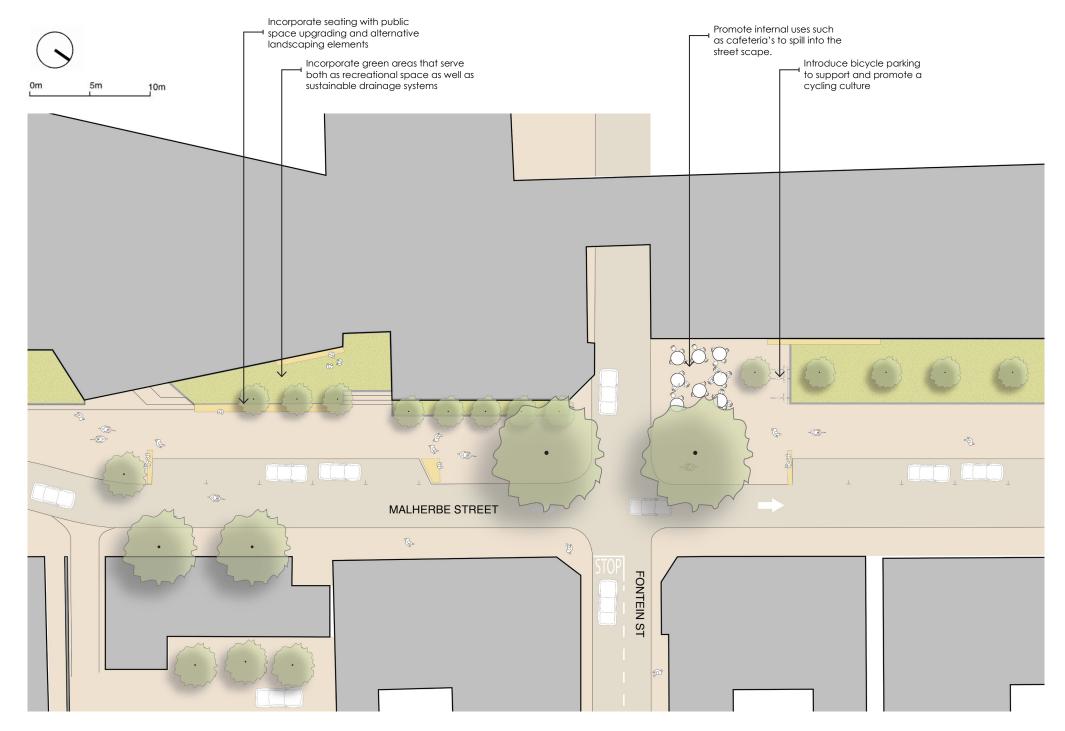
SCHOOL TO PARK | CPUT ALONG MALHERBE STREET DETAIL PLAN
